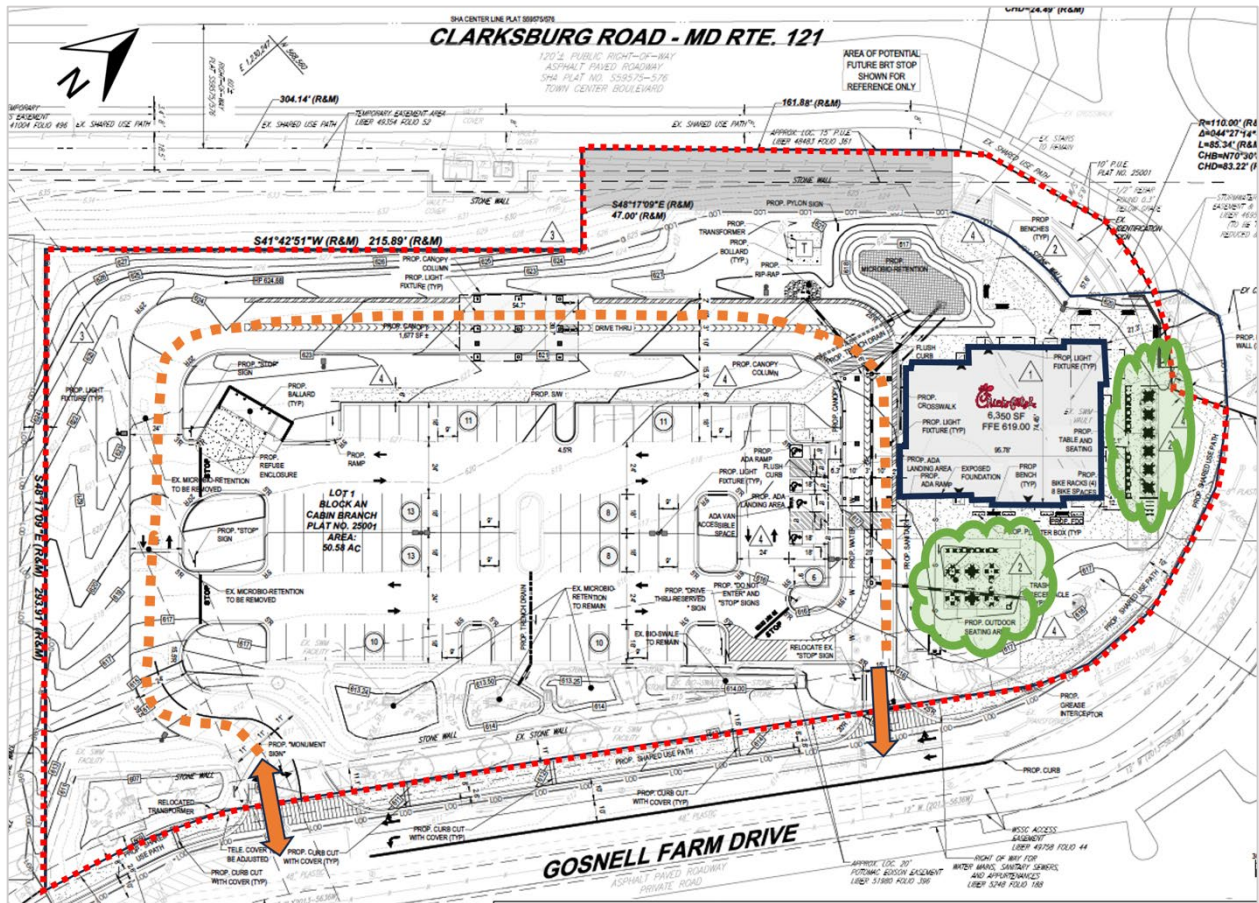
Proposed site plan, Drive-thru circulation, outdoor dining areas (green)
